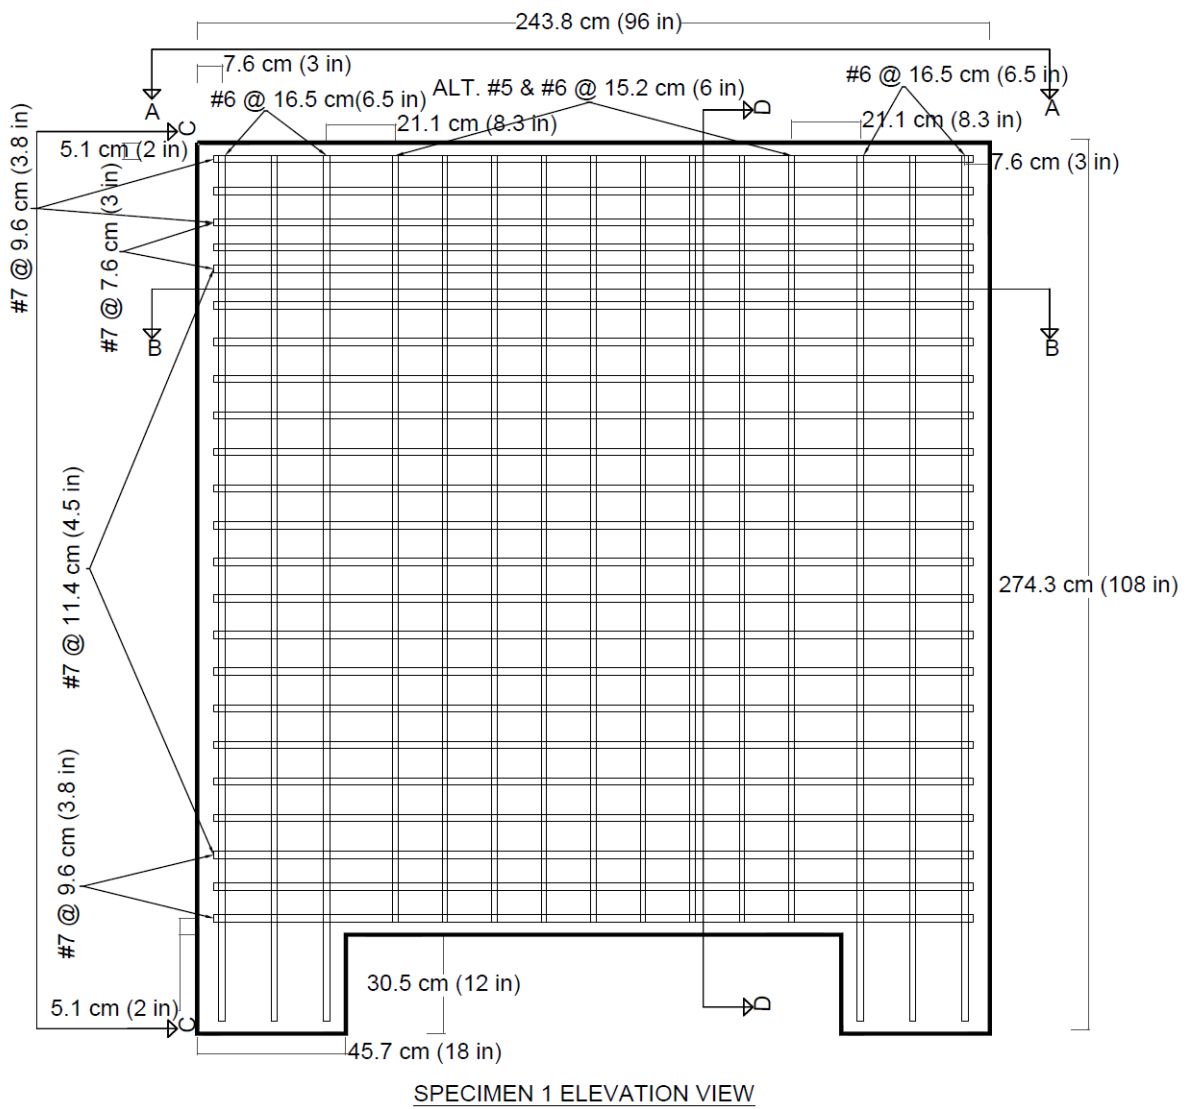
Specimen 1- Reinforcing Steel Layout Elevation View
